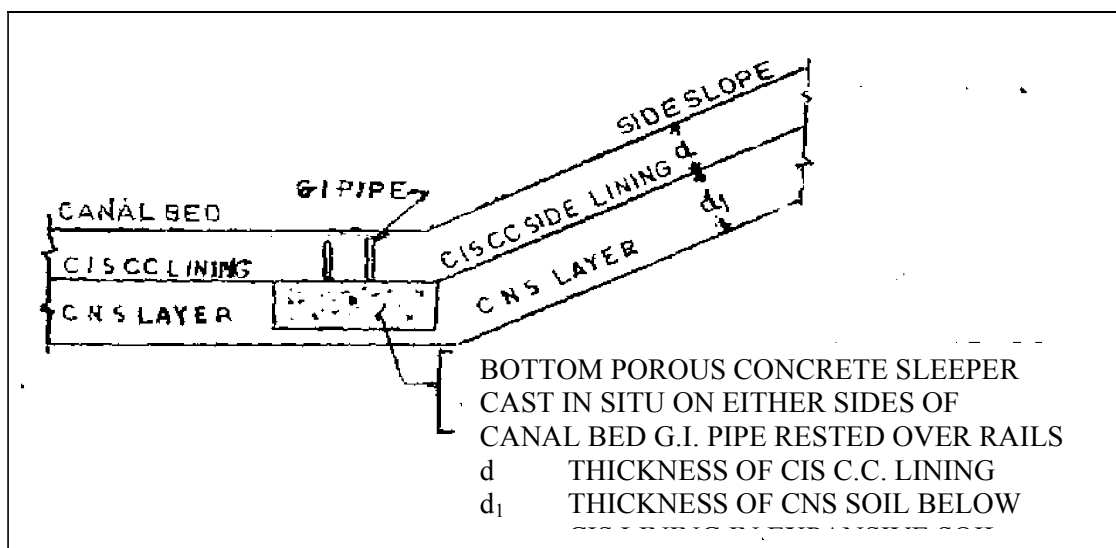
ILLUSTRATORY DETAIL OF BOTTOM RAILS
